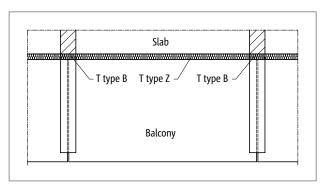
Schöck Isokorb® T type B: Balcony structure with freely cantilevered downstand beams (precast balcony)
